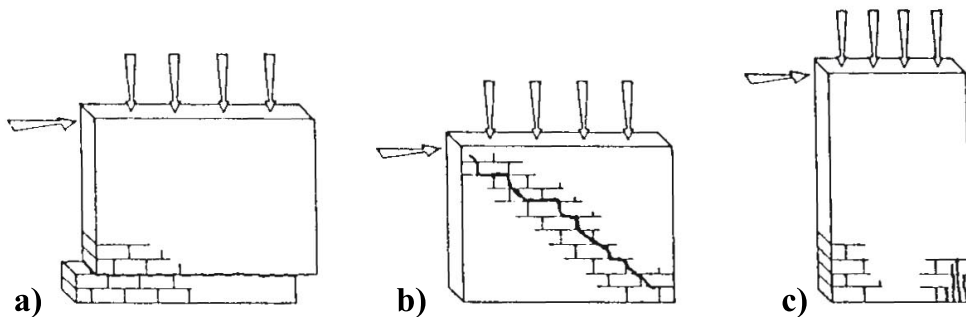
Typical failure modes of masonry piers a) Sliding b) Shear c) Rocking (from [Tom99] p.110)
